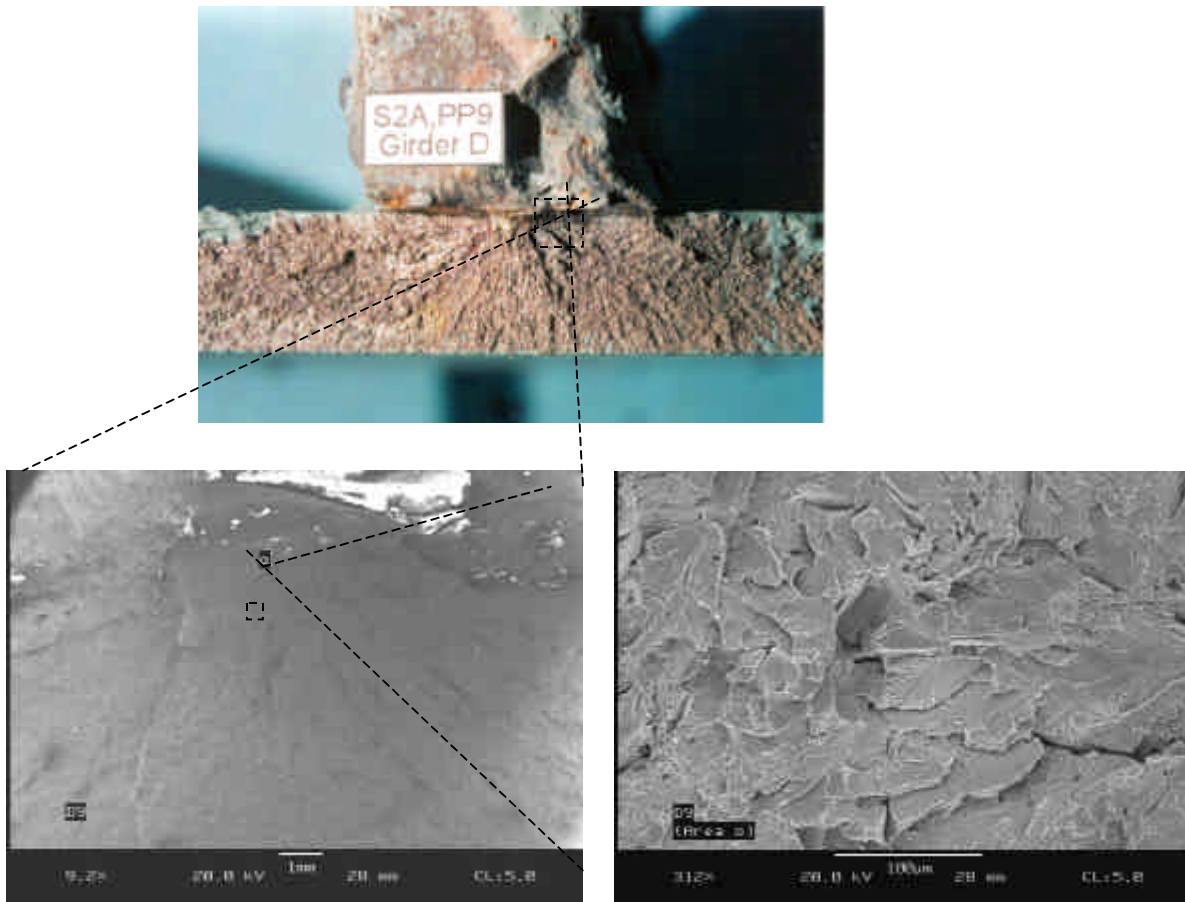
Fracture Origin in the Web Showing Cleavage Fracture (Girder D P.P. 9)
